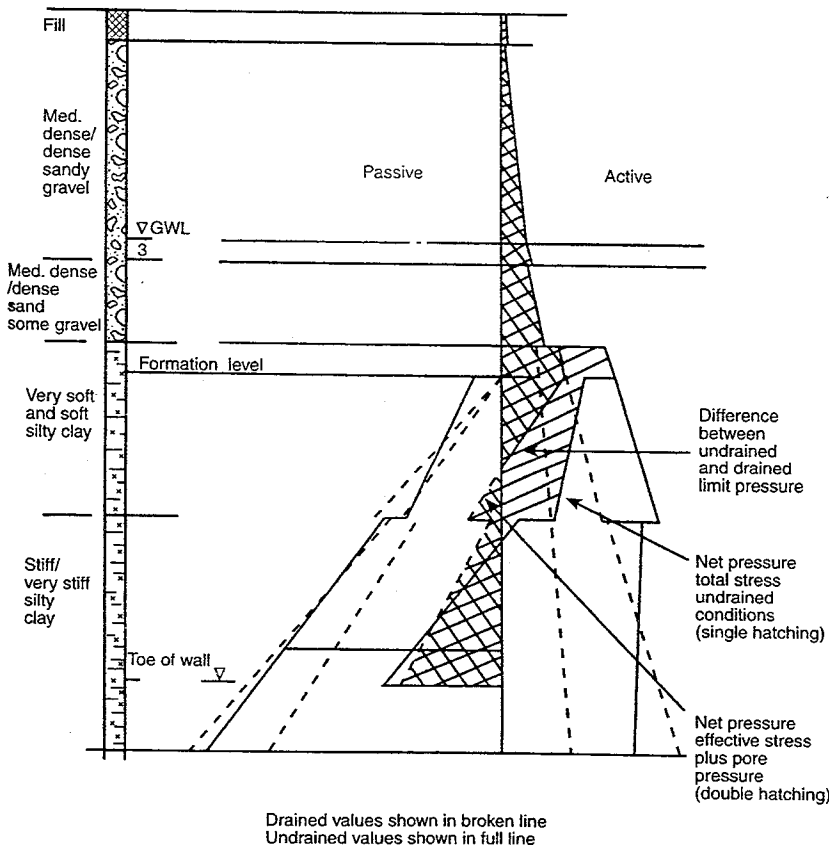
Case study braced wall: earth pressure for drained and undrained conditions plotted as net pressure diagrams, limit pressures
